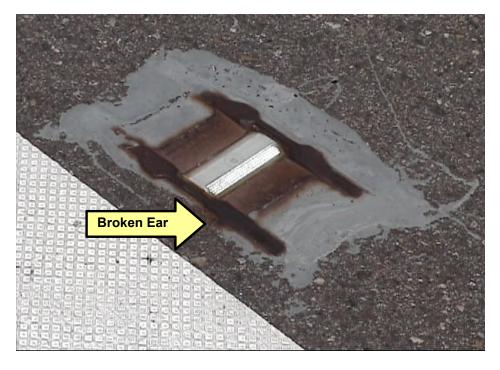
Marker with oxidized casing and a broken lower right ear.
